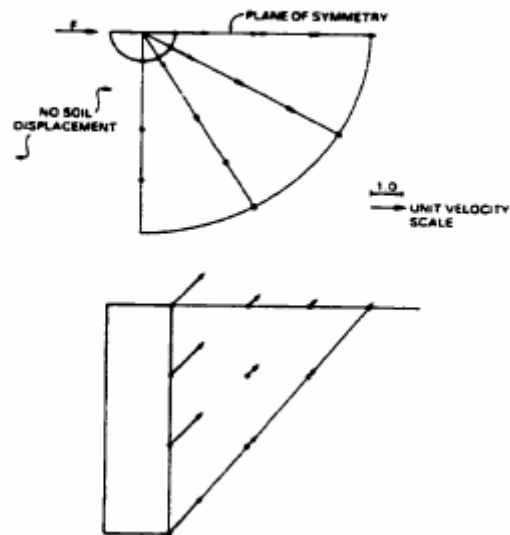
Translation mechanism: plan and cross section (Murff and Hamilton, 1993)
